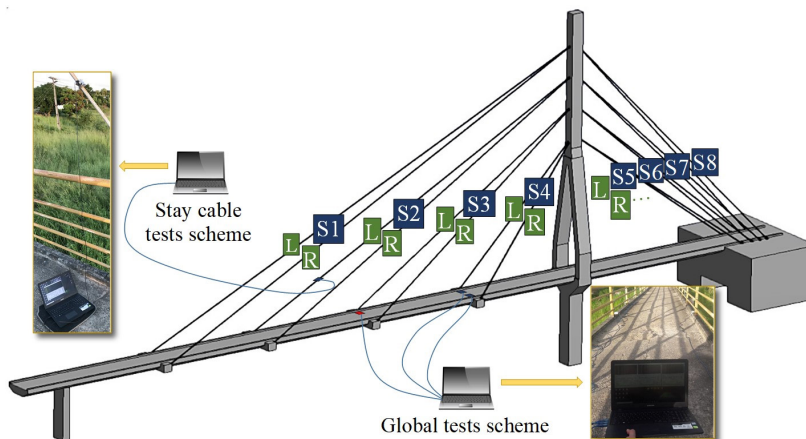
Data acquisition system installed on the footbridge – Global and stay cable tests.
